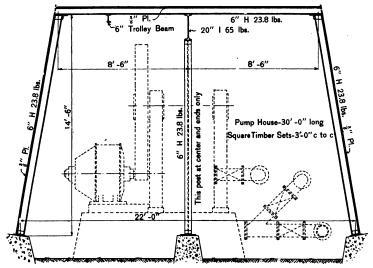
Steel Lagged, Steel Framed Pump House, Pennsylvania Coal and Coke Co. Ehrenfeld, Pa.; built in 1909.
